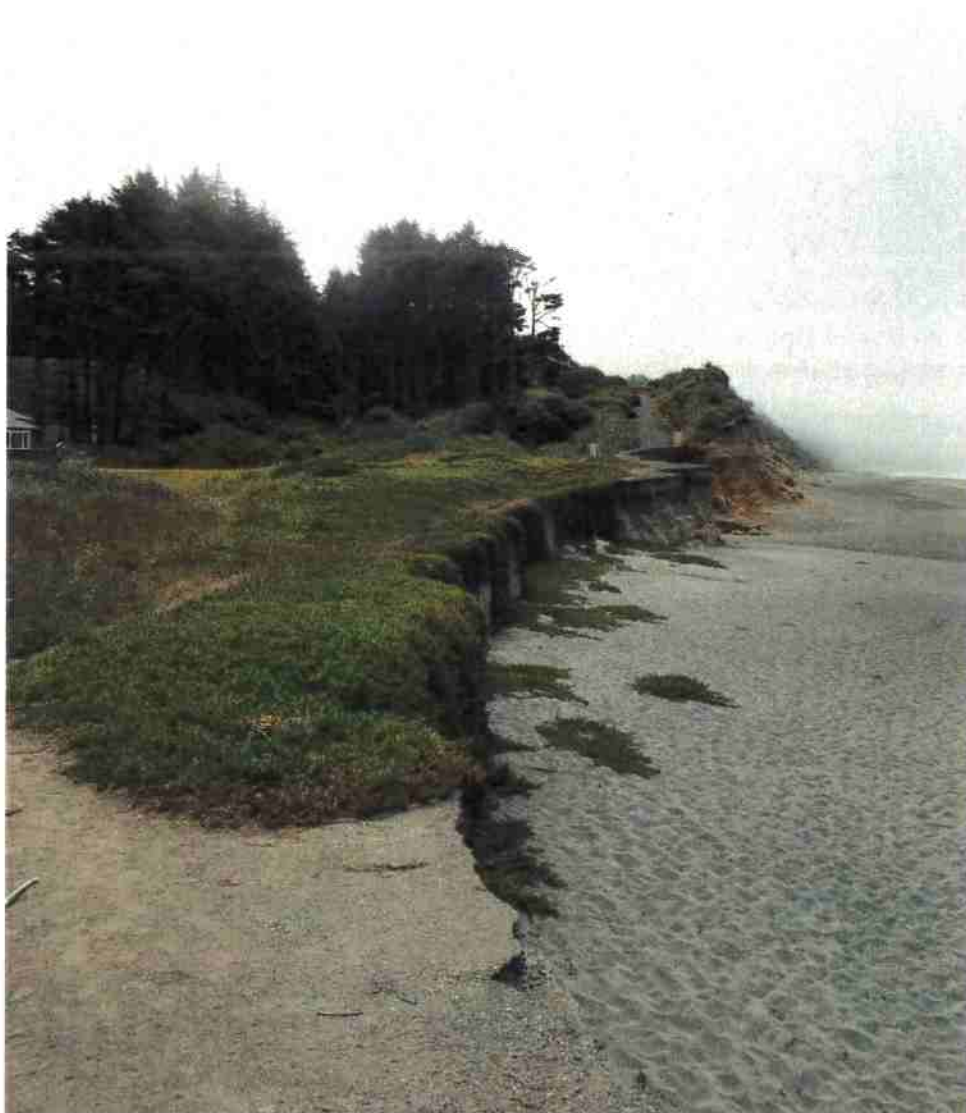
Ocean View Drive, dangerous conditions beyond guardrail
